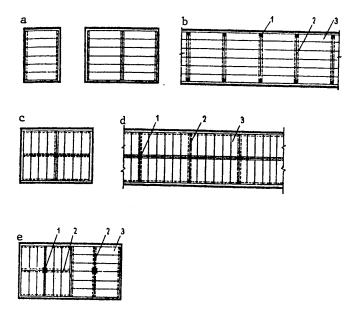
Basic structural diagrams of low-rise residential buildings. a—With transverse bearing walls; b—with transverse frame; c—with longitudinal bearing walls; d—with longitudinal frame; e—mixed diagram with inside supports; 1—columns; 2—slabs.
